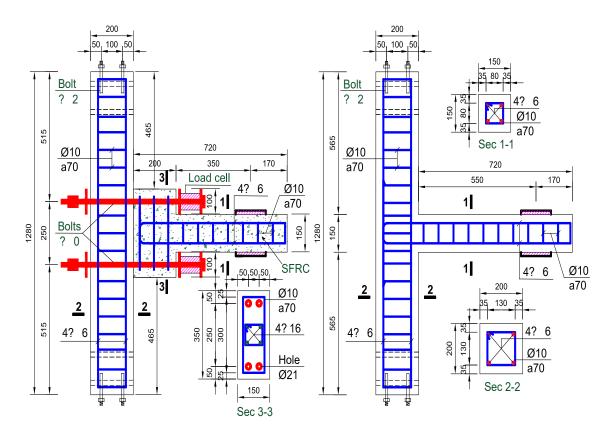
Designs of the precast specimen (Left) and monolithic specimen (Right) (unit: mm).
